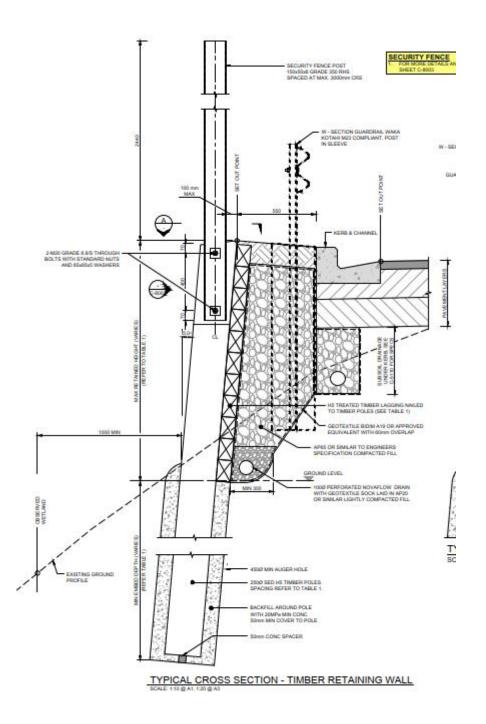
Typical cross-section of the timber retaining wall showing proximity to the delineated wetland extent (refer to Drawing Sheet C-3010)
